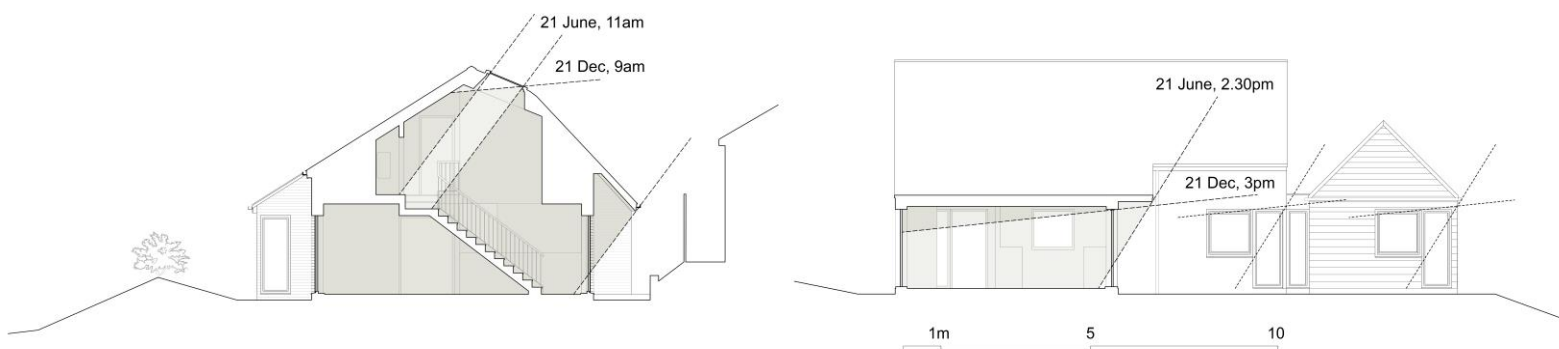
Two houses on Springvale Road, Author, 2019. Sections.
